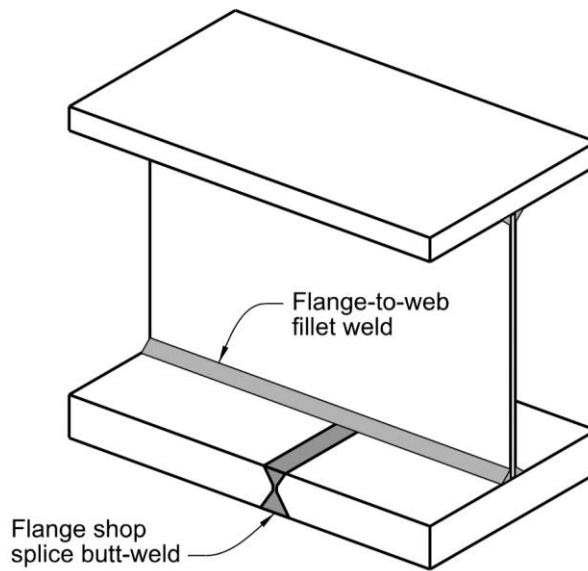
Intersection of flange-to-web fillet welds with a CJP groove weld in a butt joint used to accomplish a flange shop splice.
